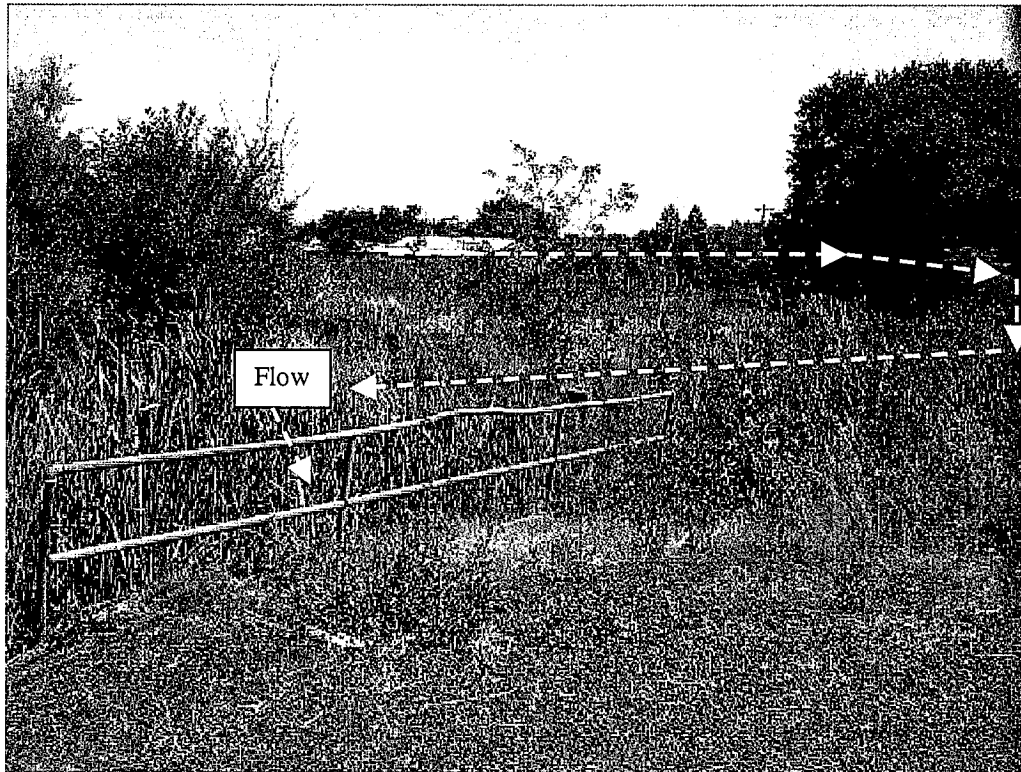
View looks upstream (north) at Waterman Creek/Gulch from bridge/concrete box culvert on Main St.
